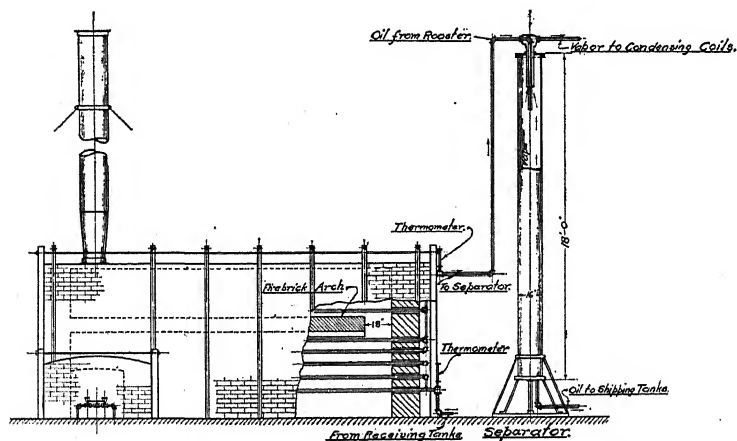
OIL-DEHYDRATING PLANT. SIDE ELEVATION.
